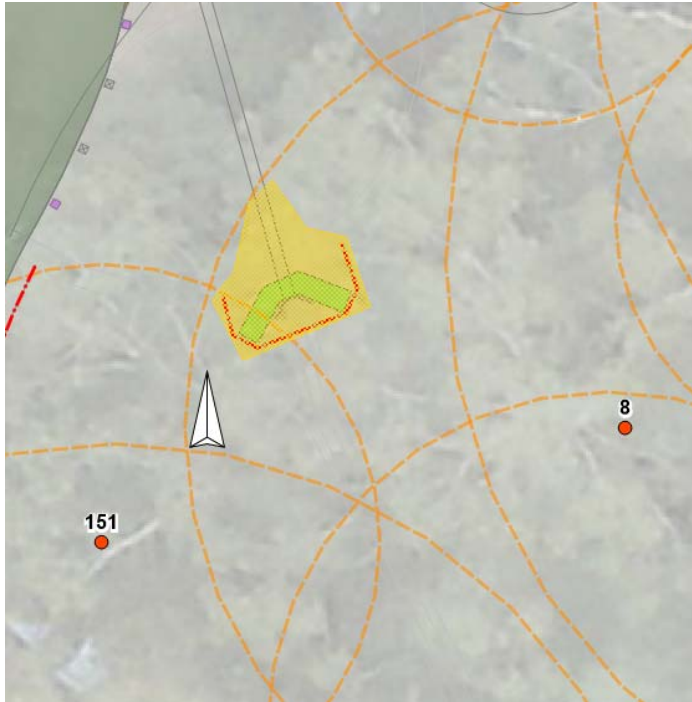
TPZ encroachments from proposed culvert pipe trench to trees #8 and 151 (shaded areas).
